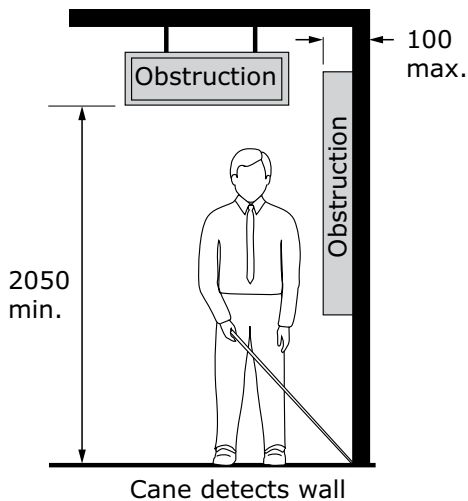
above from CSA B651 Limits of protrusions and obstructions — Less than 100 mm from wall (See Clauses 4.5.1.1 and 4.5.2.2.)
